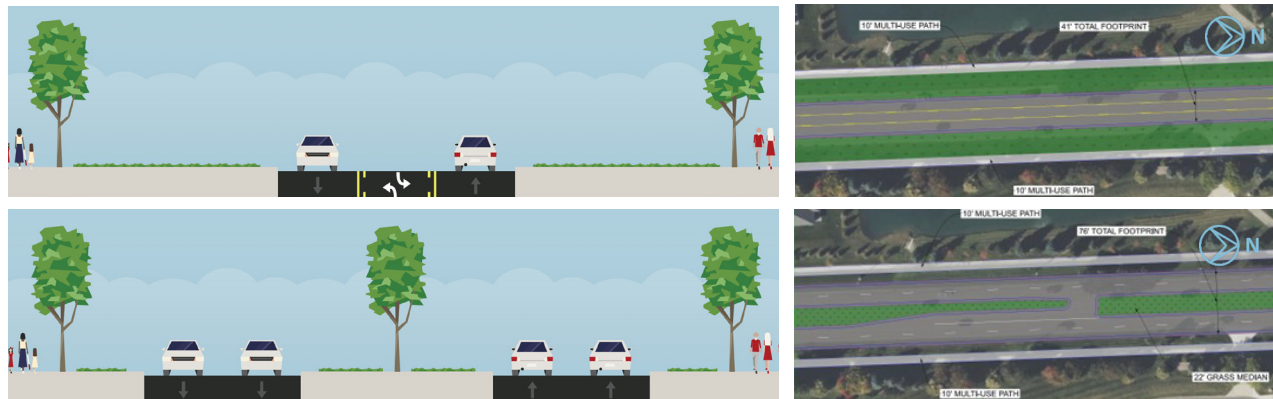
Alternative 7 Typical Cross-Sections and Aerial Views
